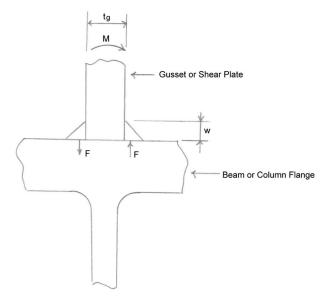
Section of Gusset or Shear Plate and Beam or Column
